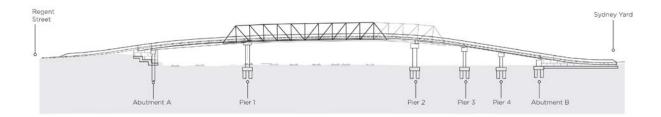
Indicative illustration of Sydney Yard Access Bridge from Regent Street
